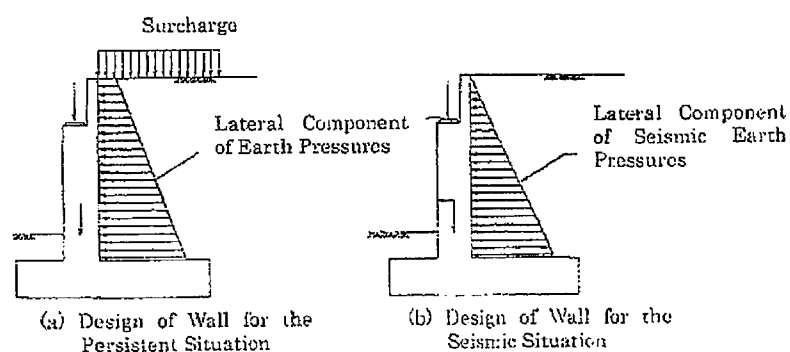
Loads in Calculating a Wall Section of Reverse T-shaped Abutment
